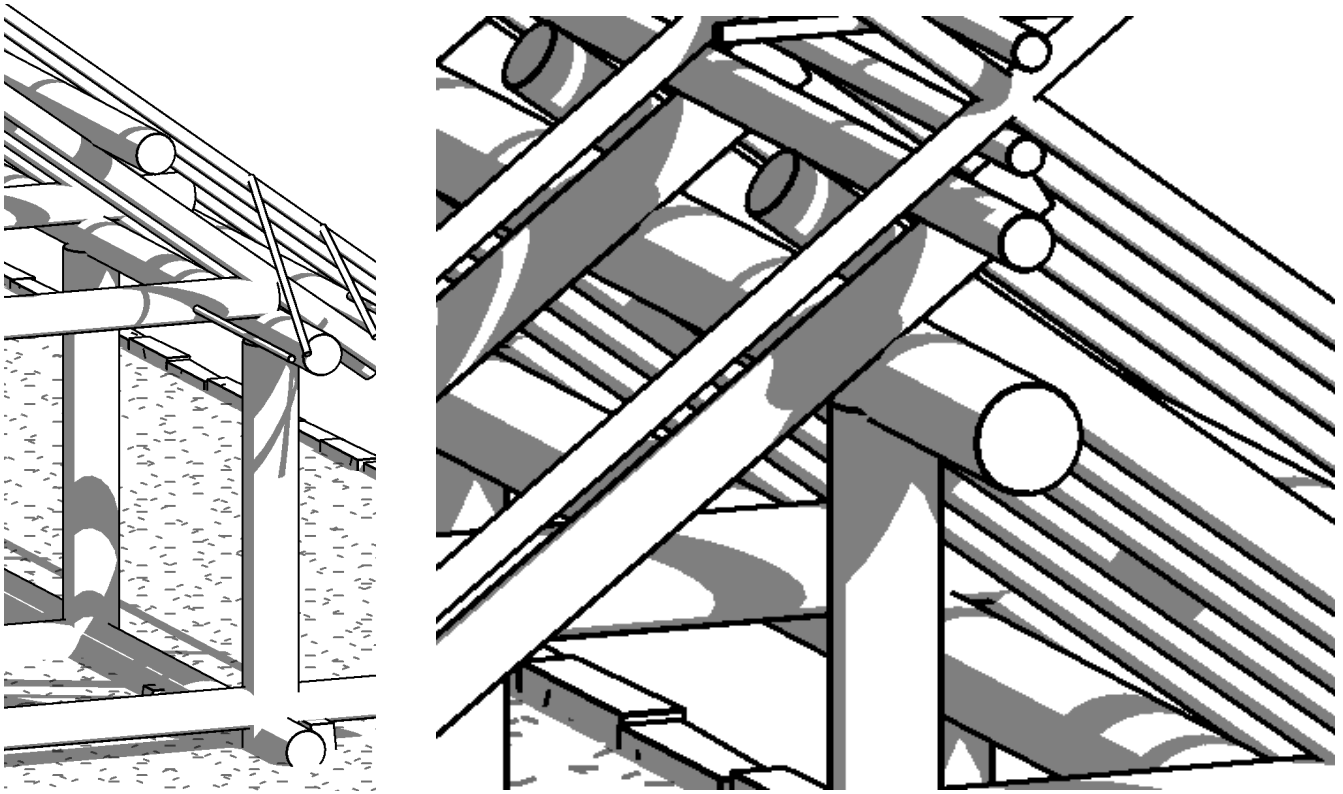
Left - detail view of post-to-beam connection & right - niu momoli (4th ridge pole) at roof apex
